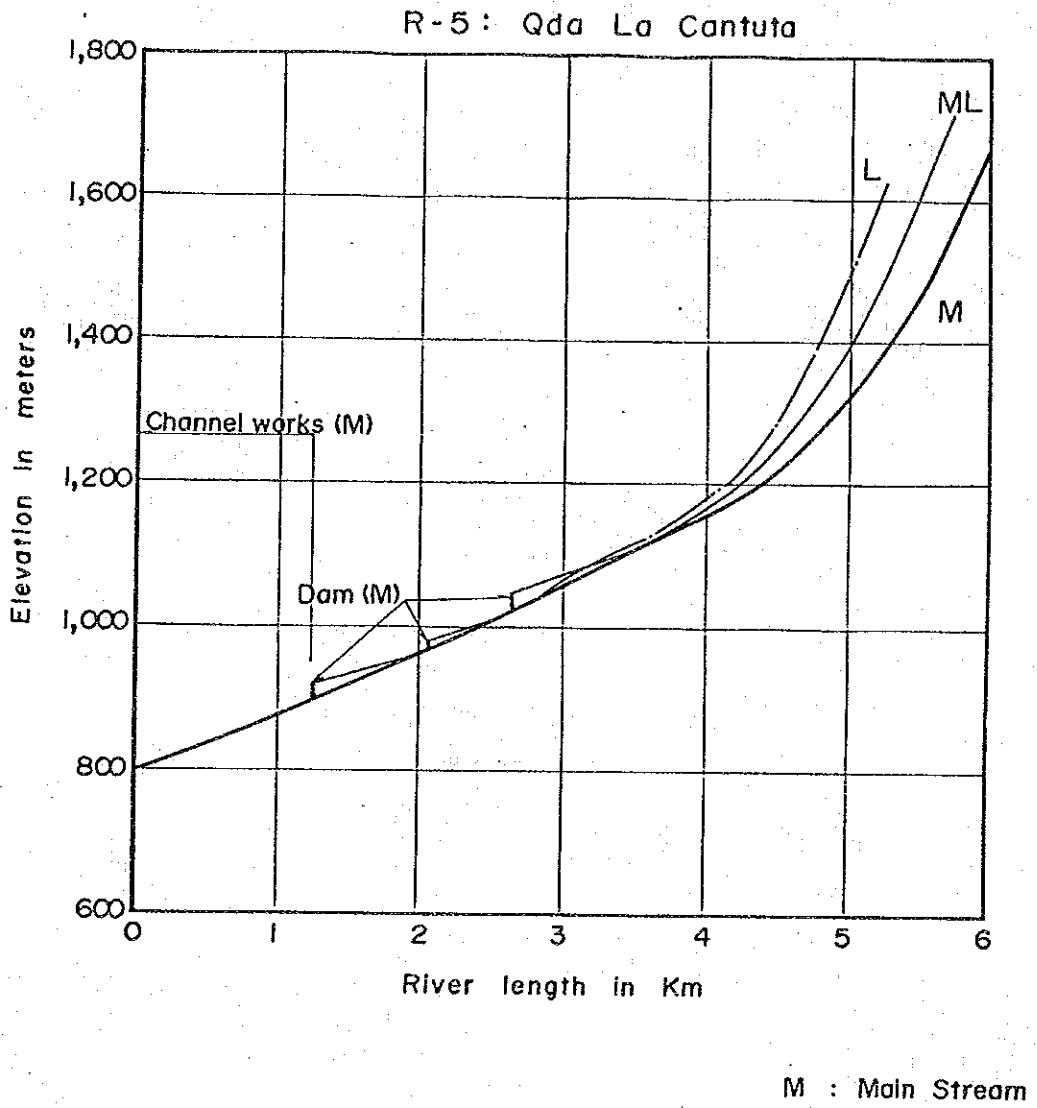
Structural Plan on Profile of Qda La Cantuta (R5)
